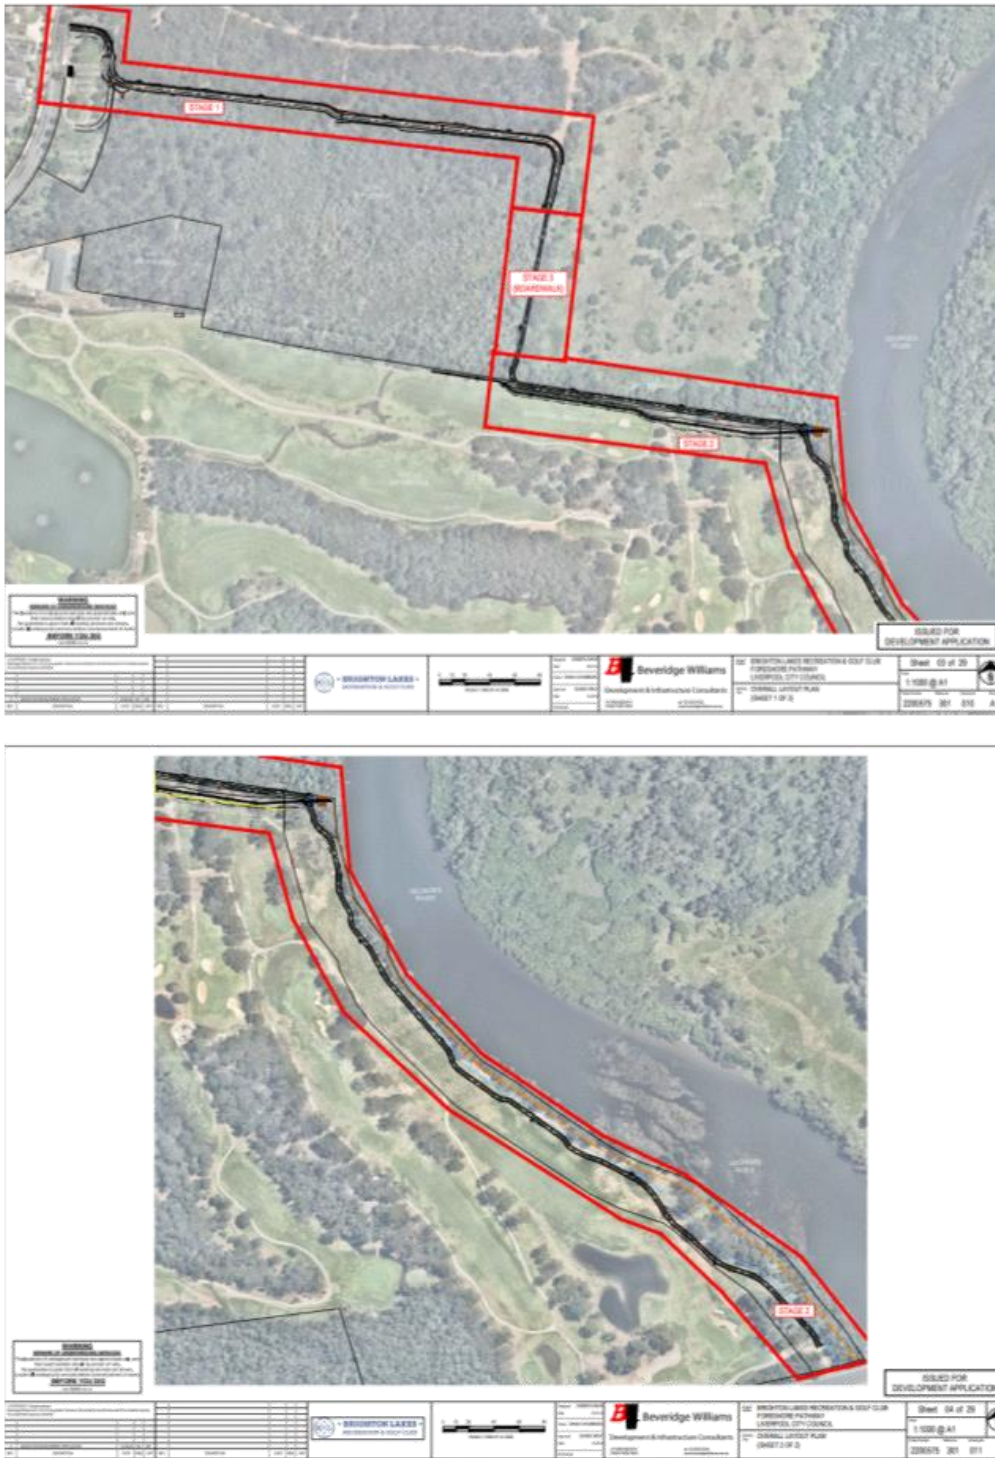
A - Layout plan of the proposed development showing Stages 1, Stage 2 and Stage 3 (all within red outlines) (for detail see Beveridge Williams 2024)
